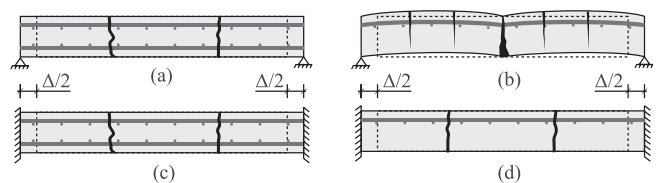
Crack formation from imposed deformations Δ of a water tank wall segment (plan curvature of the wall neglected): (a) and (c) symmetrically reinforced wall segment with pin support and full rotational restraint, respectively; (b) and (d) eccentrically reinforced wall segment with pin support and full rotational restraint, respectively.
